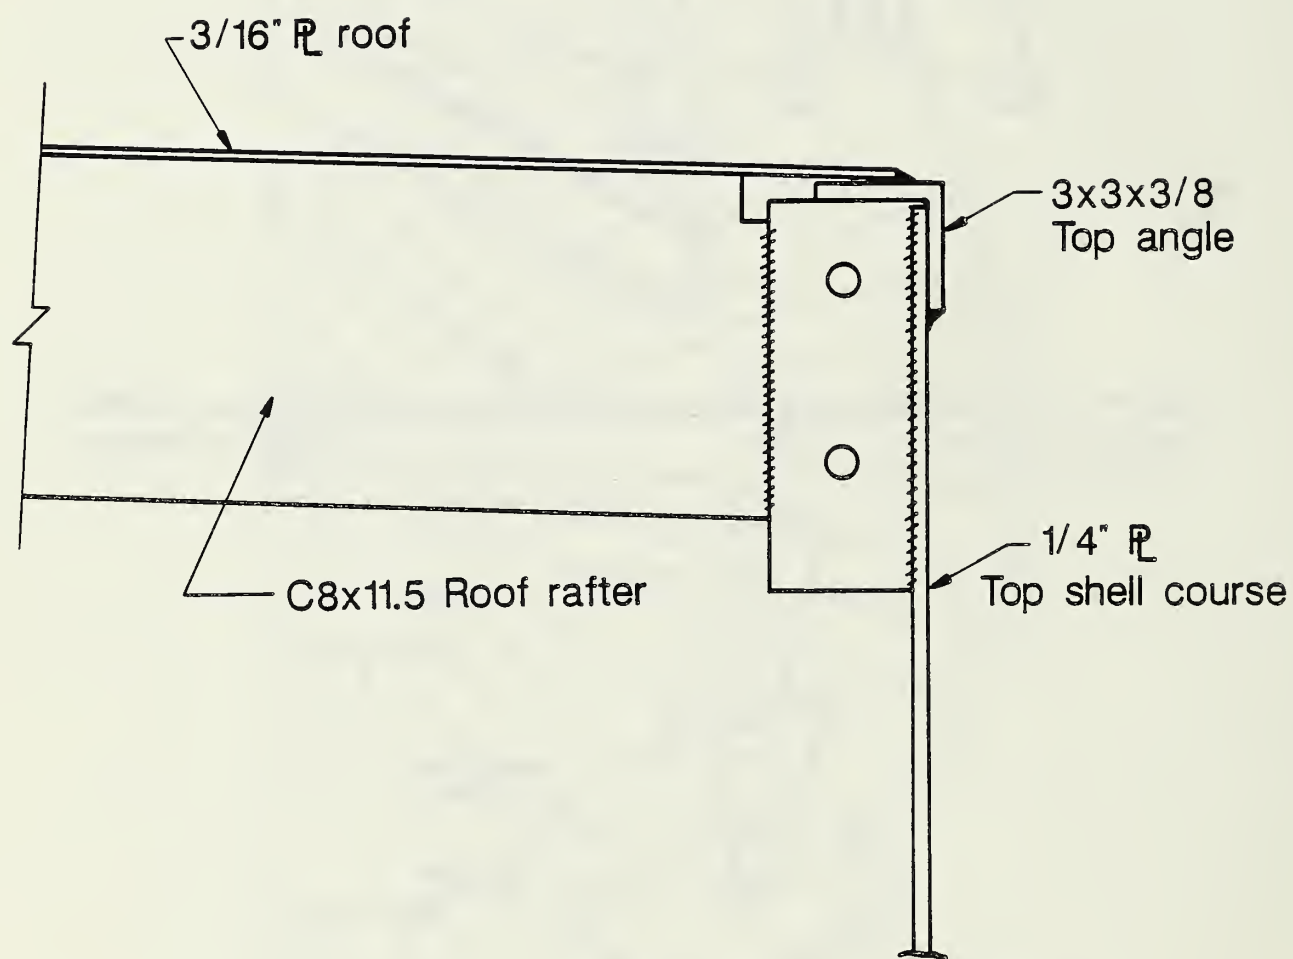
Roof Rafter Attachment to Tank Shell
